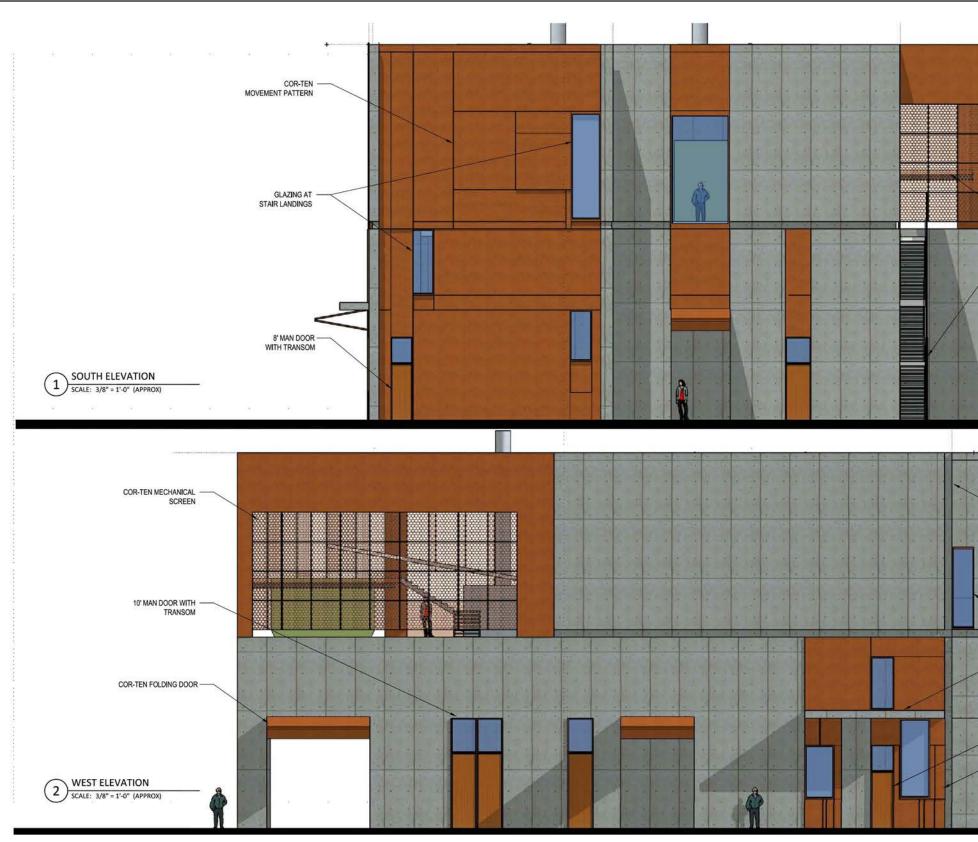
Architectural Elevations Sludge Dewatering and Loadout Facility City of Palo Alto Palo Alto, CA
